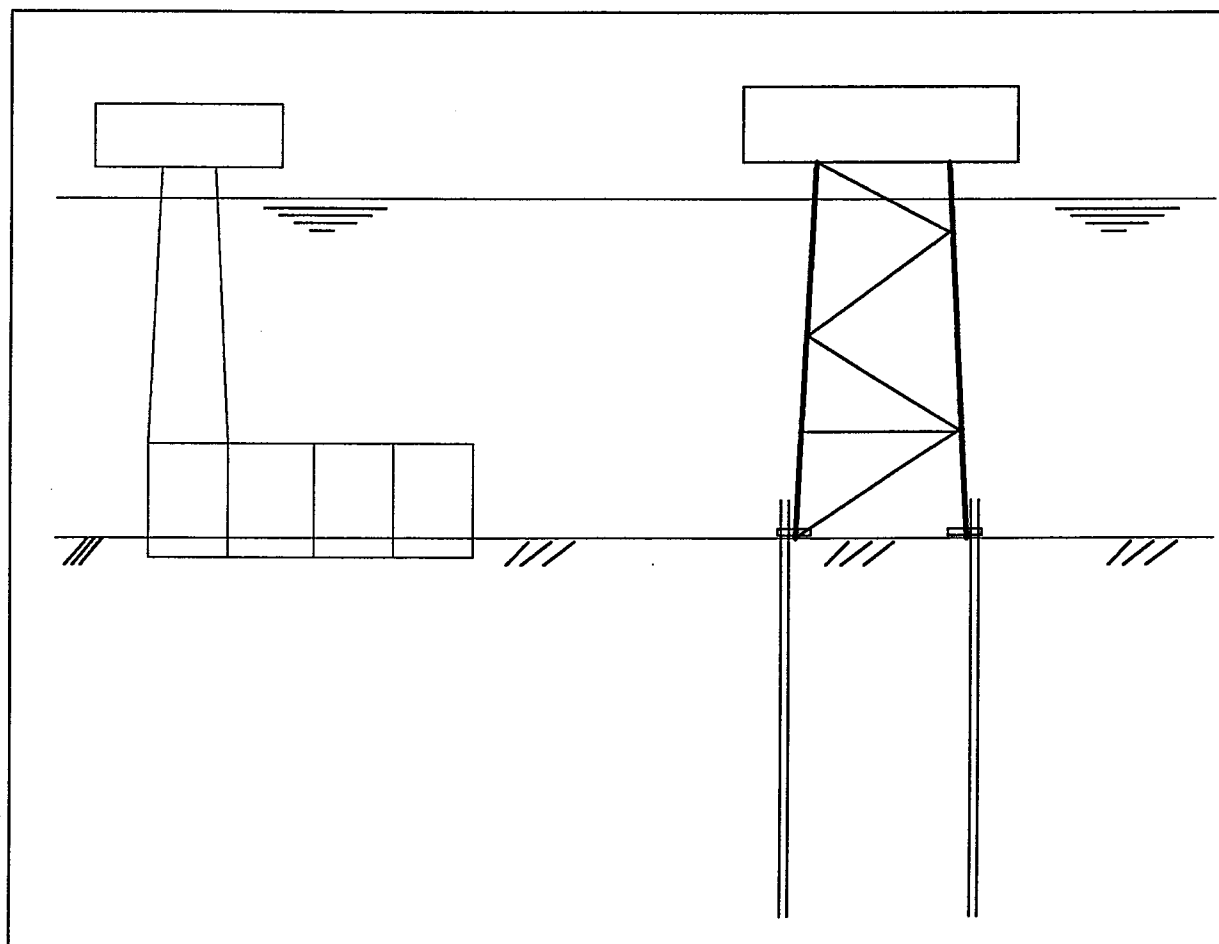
Concrete Gravity Structure and Piled Jacket Structure
